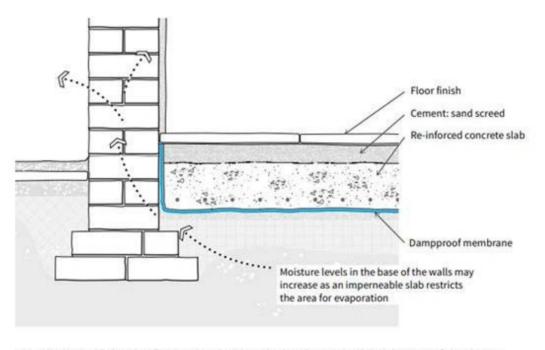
Suspended timber floor replaced with uninsulated concrete slab & dampproof membrane Many suspended timber floors have been removed in the past and replaced with un-insulated concrete slabs installed over a damp proof membrane. This can in
